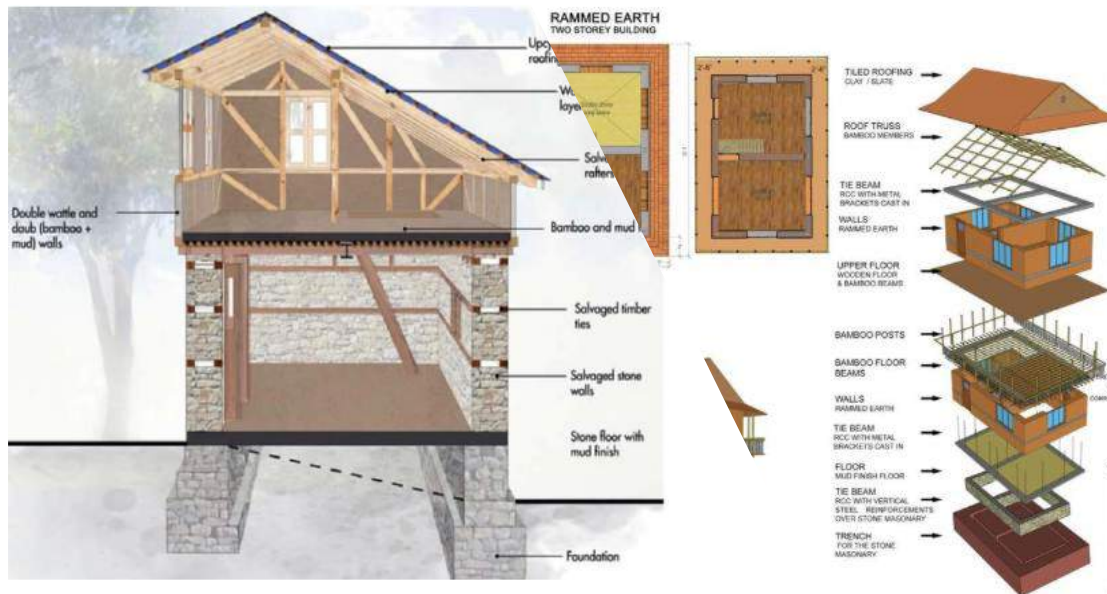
Proposed Housing Type - Maintaining Assam Vernacular Architectural Language
